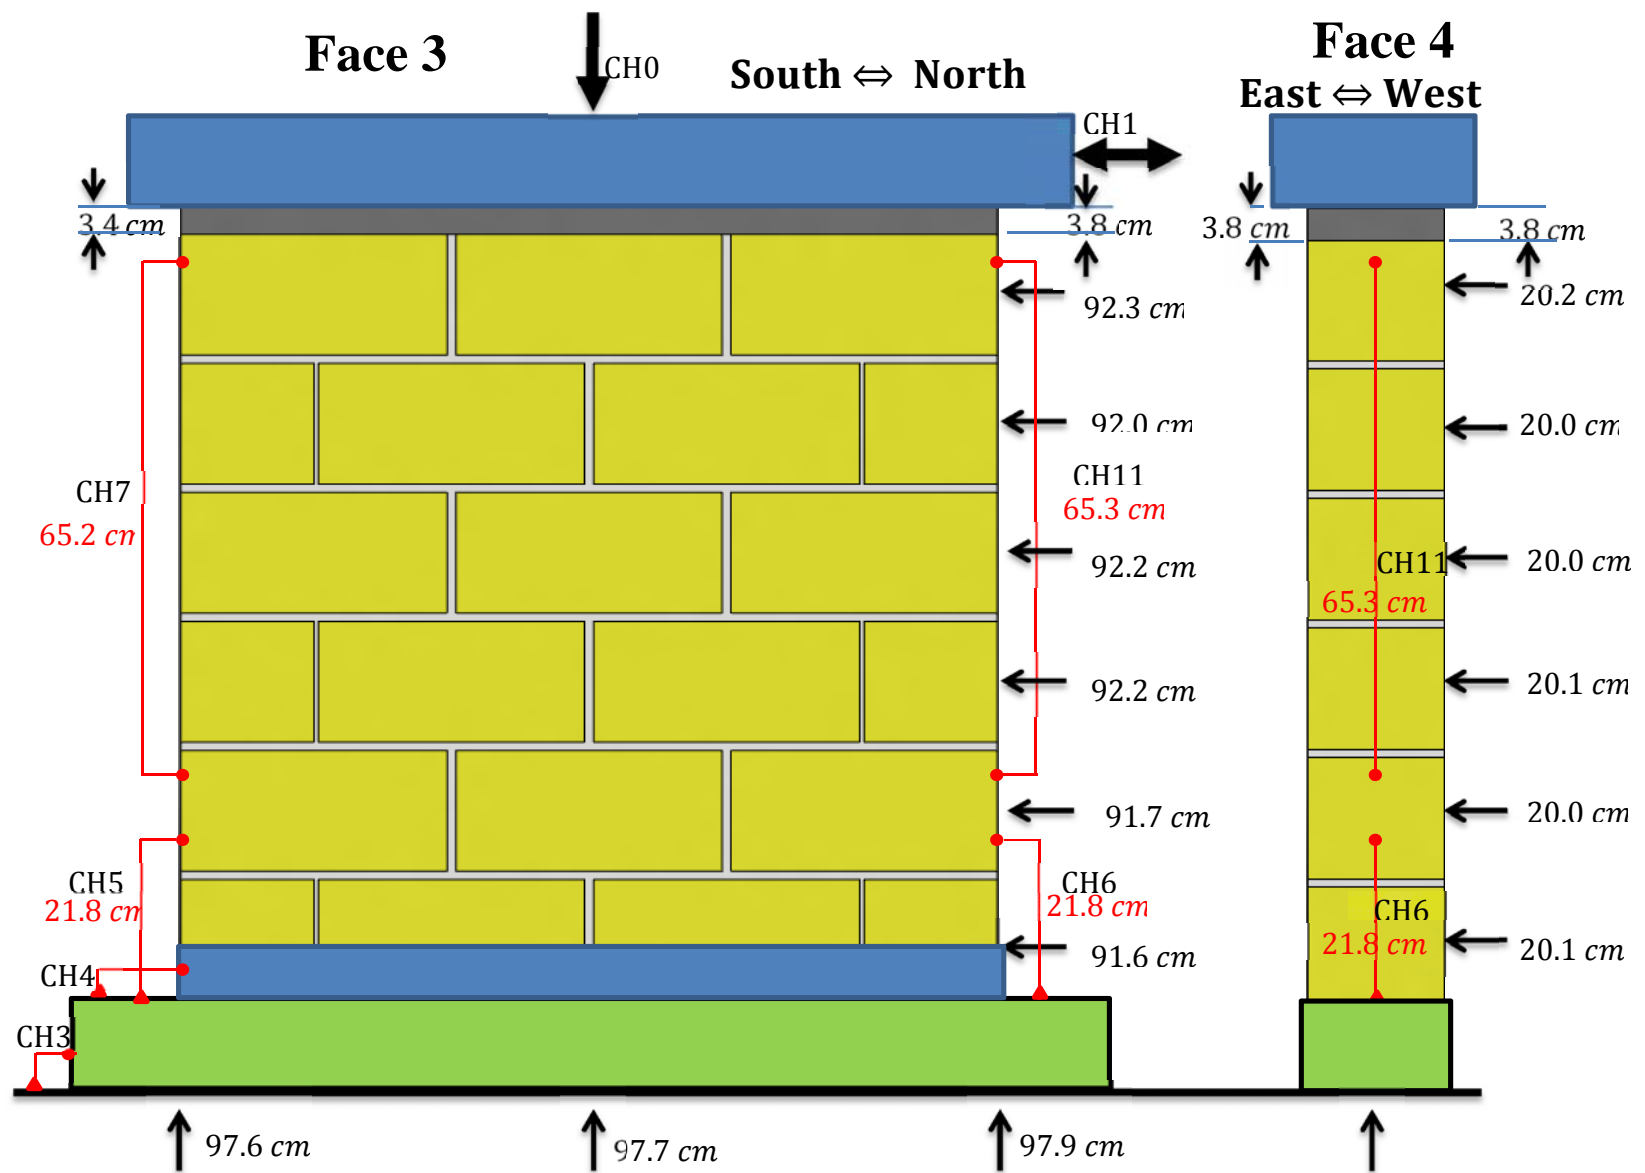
Dimensions and LVDTs configuration of wall-1.7
